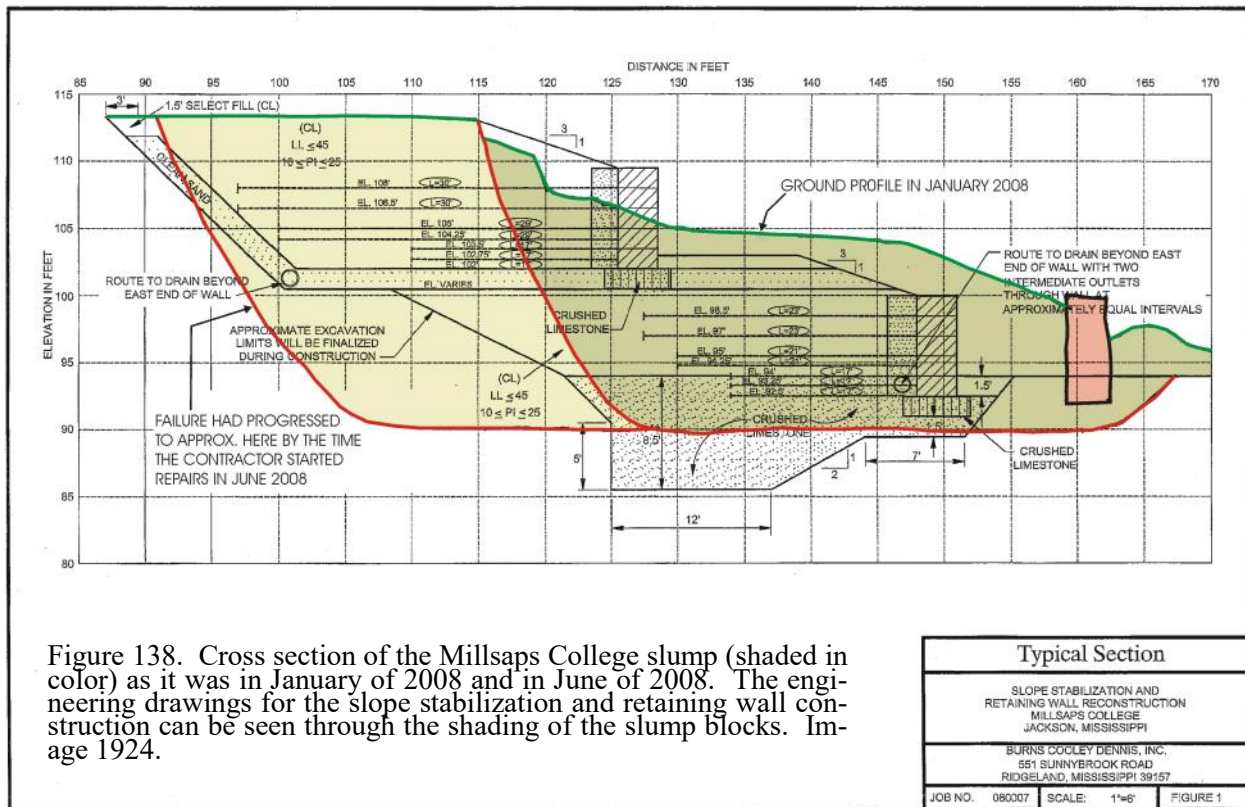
Cross section of the Millsaps College slump (shaded in color) as it was in January of 2008 and in June of 2008. The engineering drawings for the slope stabilization and retaining wall construction can be seen through the shading of the slump blocks. Image 1924.
